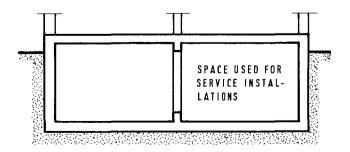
TANKED BASEMENT OR BUOYANCY FOUNDATION
